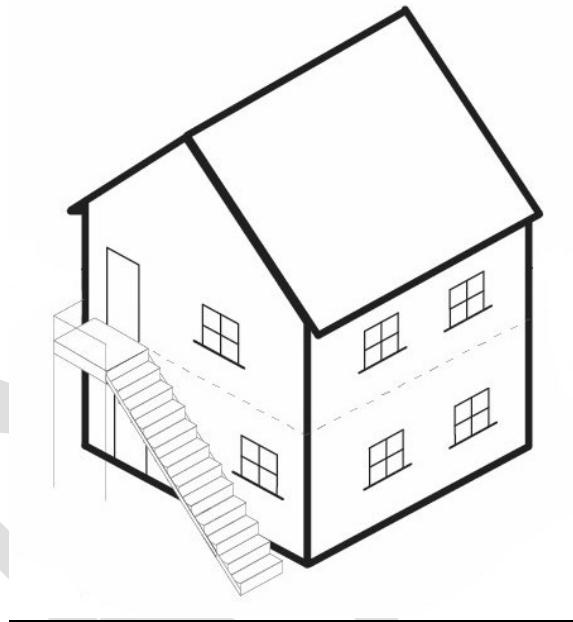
D: TOWNHOUSE CONTAINING
